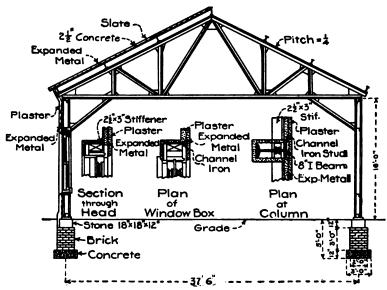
Cross-section of Steel Building Covered with Expanded Metal and Plaster.
